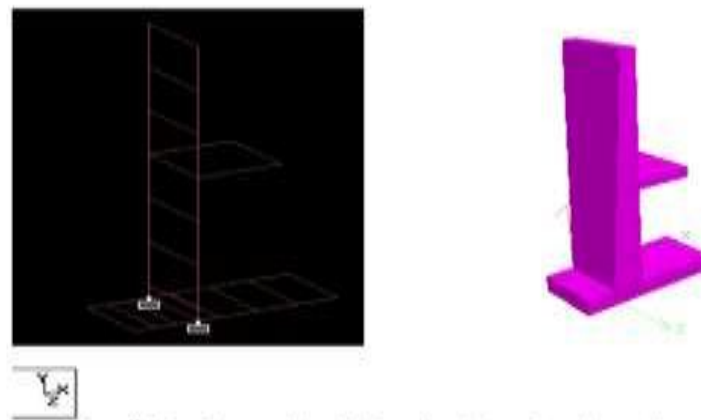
Plate model and 3-D rendered view of retaining wall
